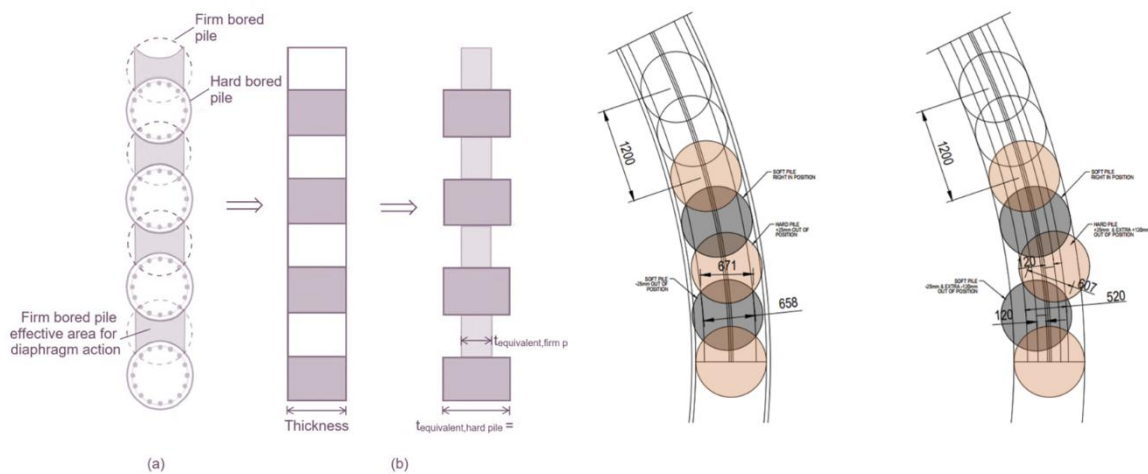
Secant pile wall: (a) as to be constructed; (b) modelled as rectangular slots as plate, (c) nominal pile position and (d) maximum allowed construction tolerance.
